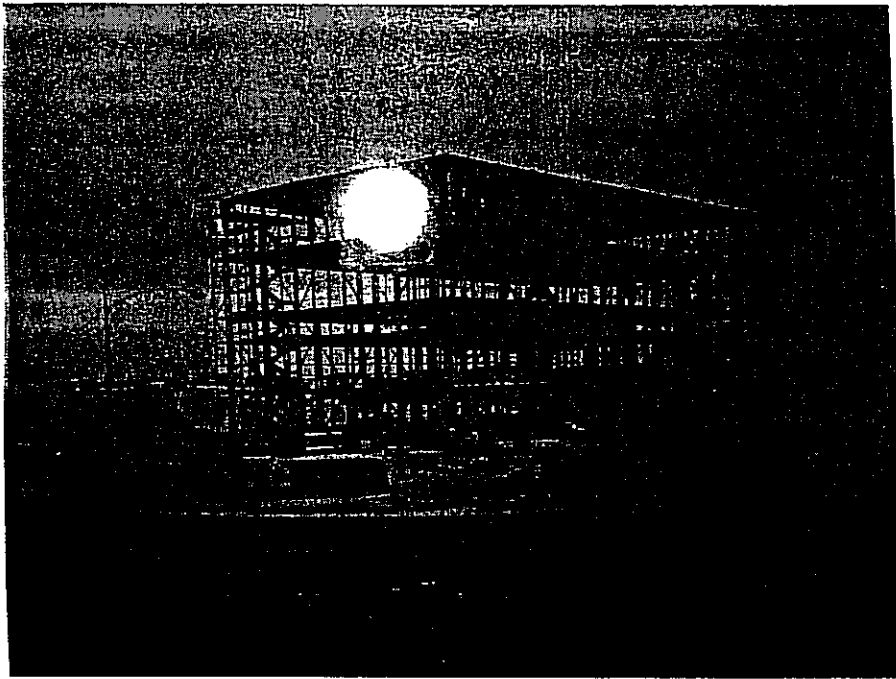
Existing photograph of the construction of Building 1003 as displayed in Lobby. Notice the framing of four story levels with 19 to 25 feet story heights.
